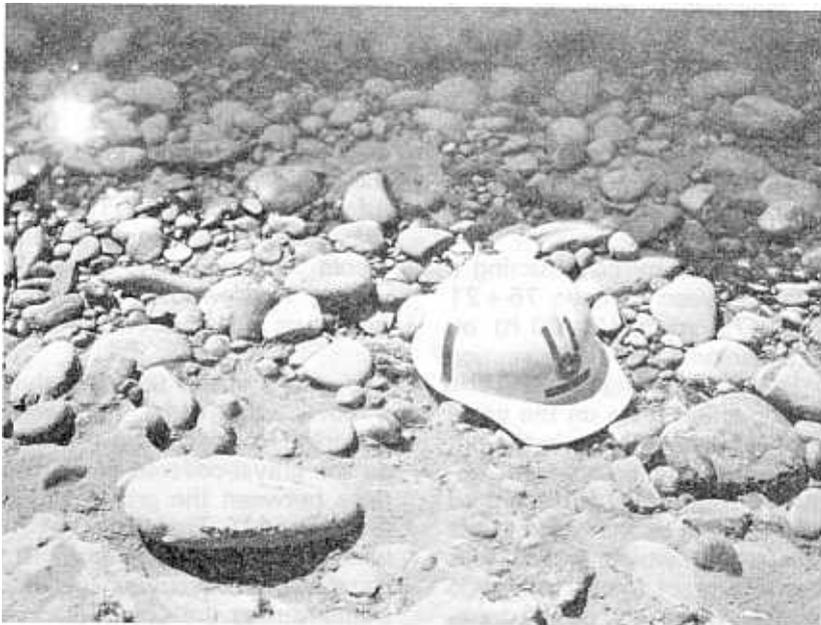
Amarillo Canal. Typical slope condition at station 123+14 m (404+00 ft) in section 4A. August 1980 Photo P801-D-79544
